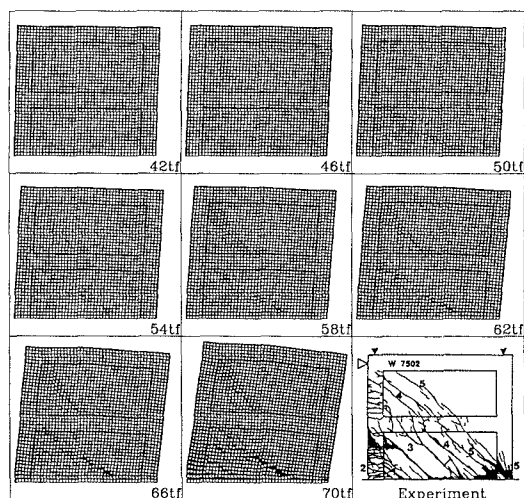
Deformed shape and crack locations of 2-storied RC wall structure (Scale Factor=30)
